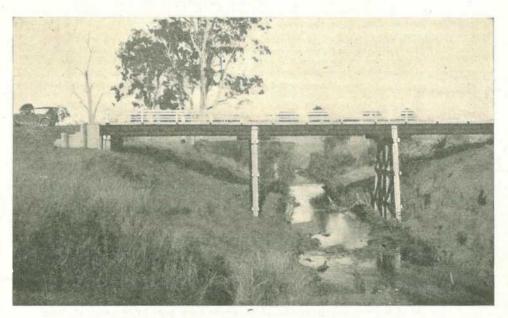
TIMBER BRIDGE AT MCLEAN'S CROSSING, BRISBANE-WARWICK ROAD.
